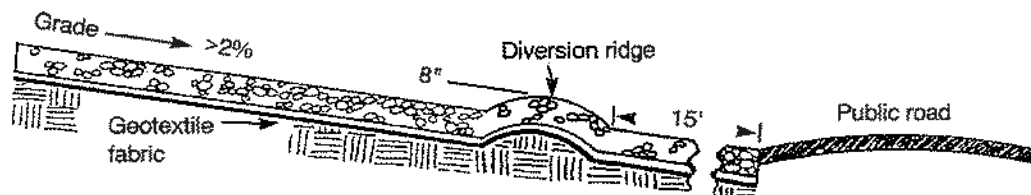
Cross-section of a Construction Entrance/Exit (NC, 1993)
